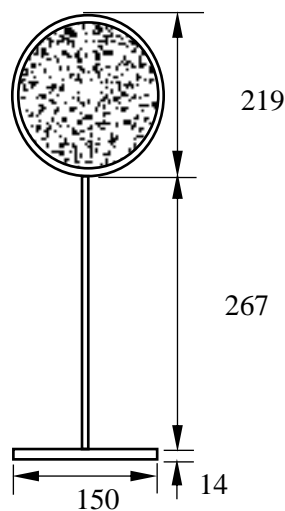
Cross-section of a composite beam with a concrete filled circular tubular flange (all units in mm)
